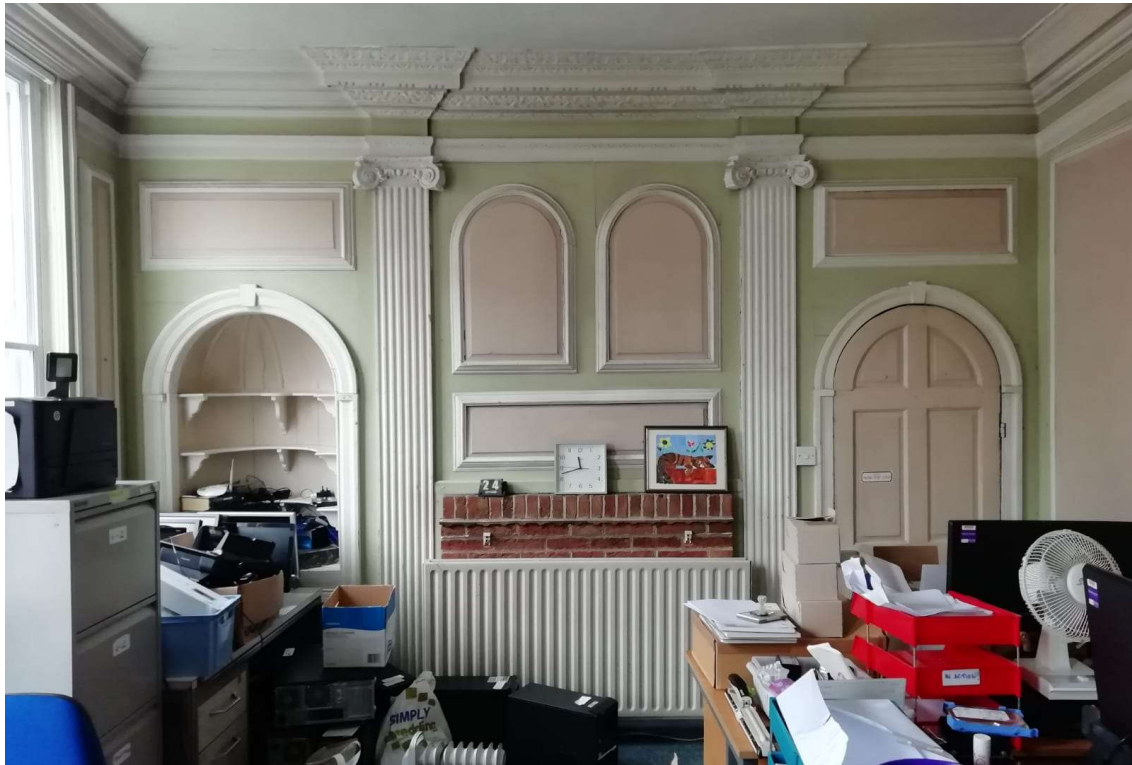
First floor, front, left room. Door to right leads to former back stairs, now a cupboard (radiator to be removed and modern fireplace replaced)
